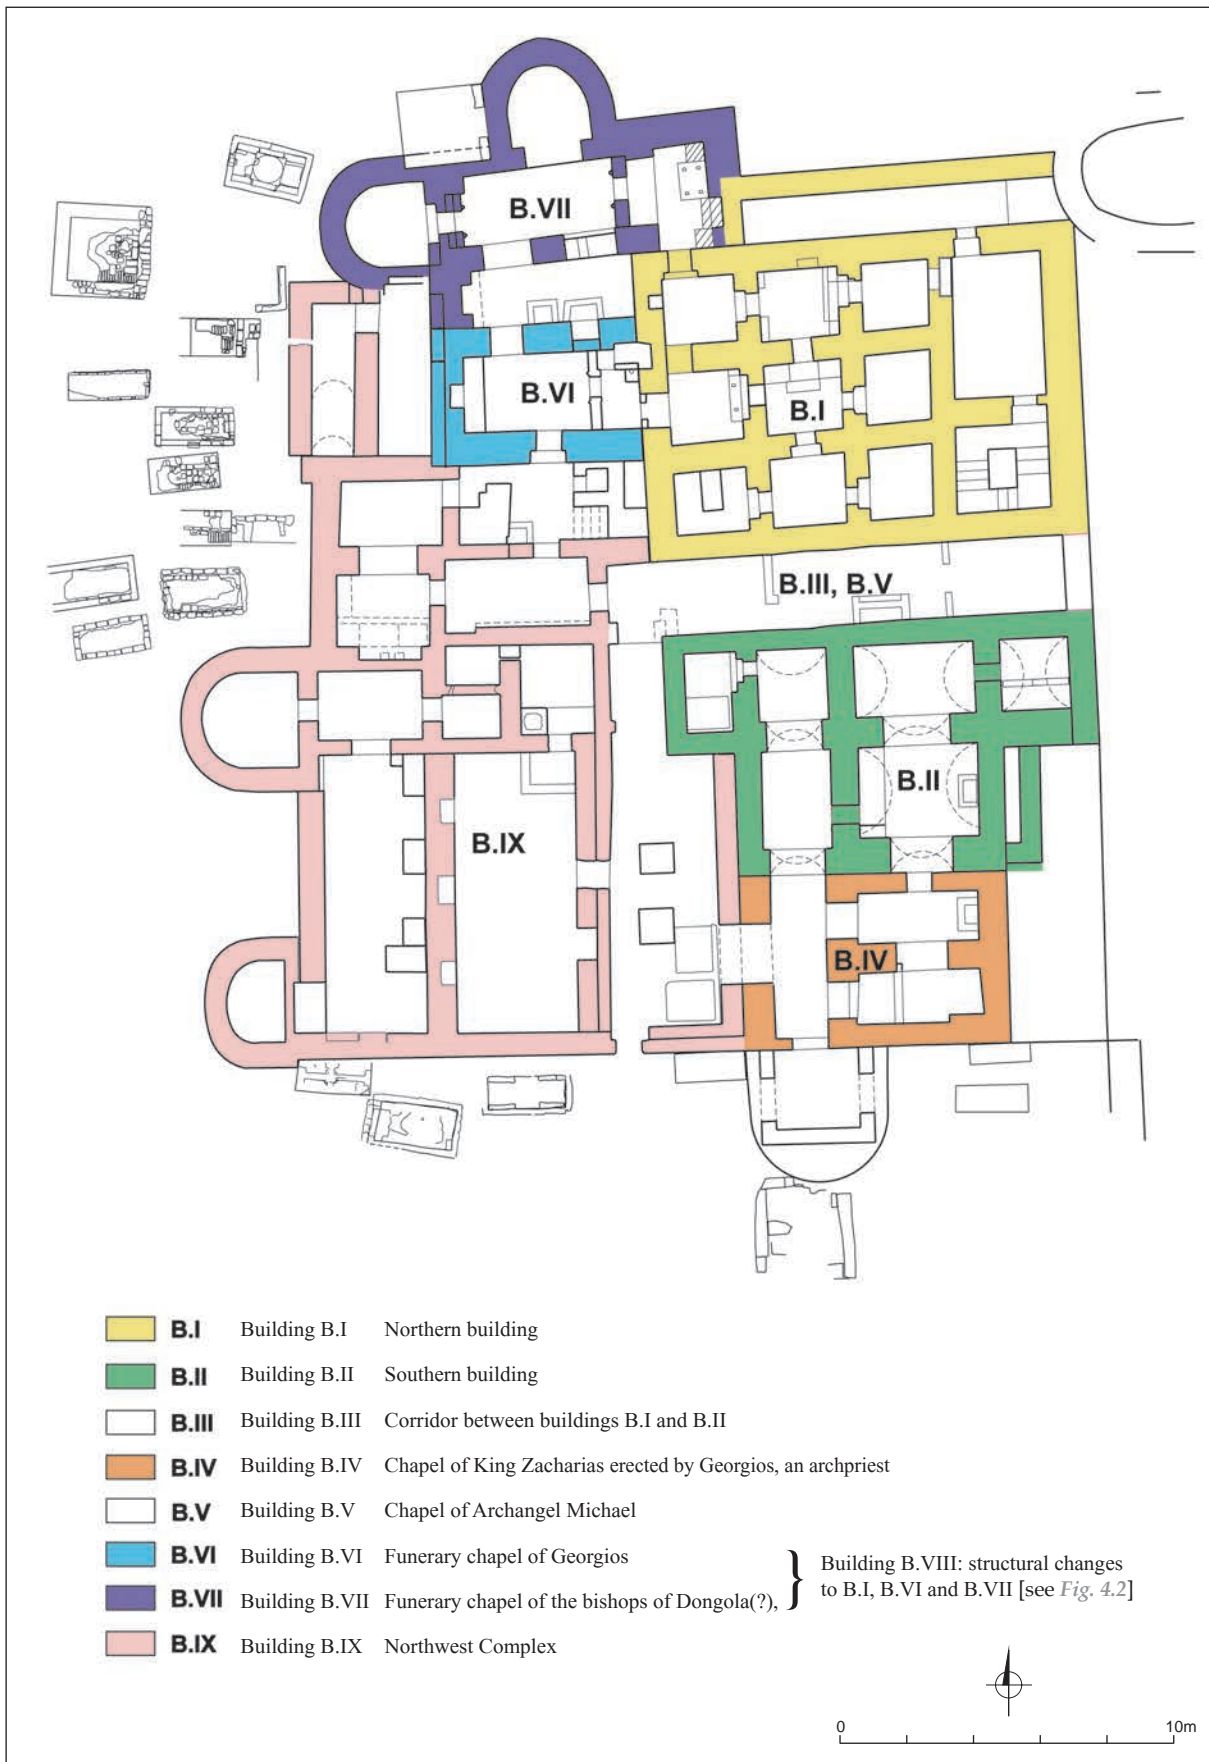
The Northwest Complex in the Great Monastery of St Anthony: plan distinguishing structural units
